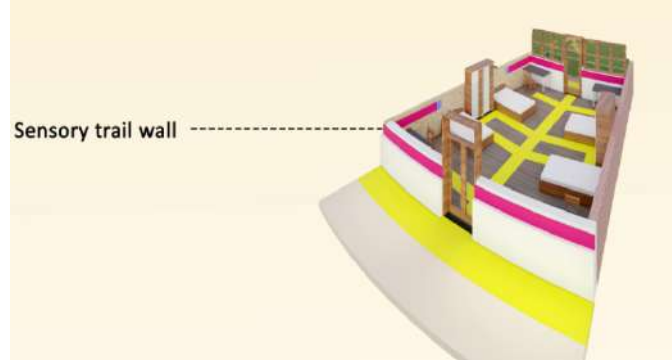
Shows the placement of sensory trail wall along the dormitory's corridor. Source: Author, 2024.
